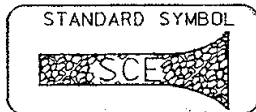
STABILIZED CONSTRUCTION ENTRANCE
